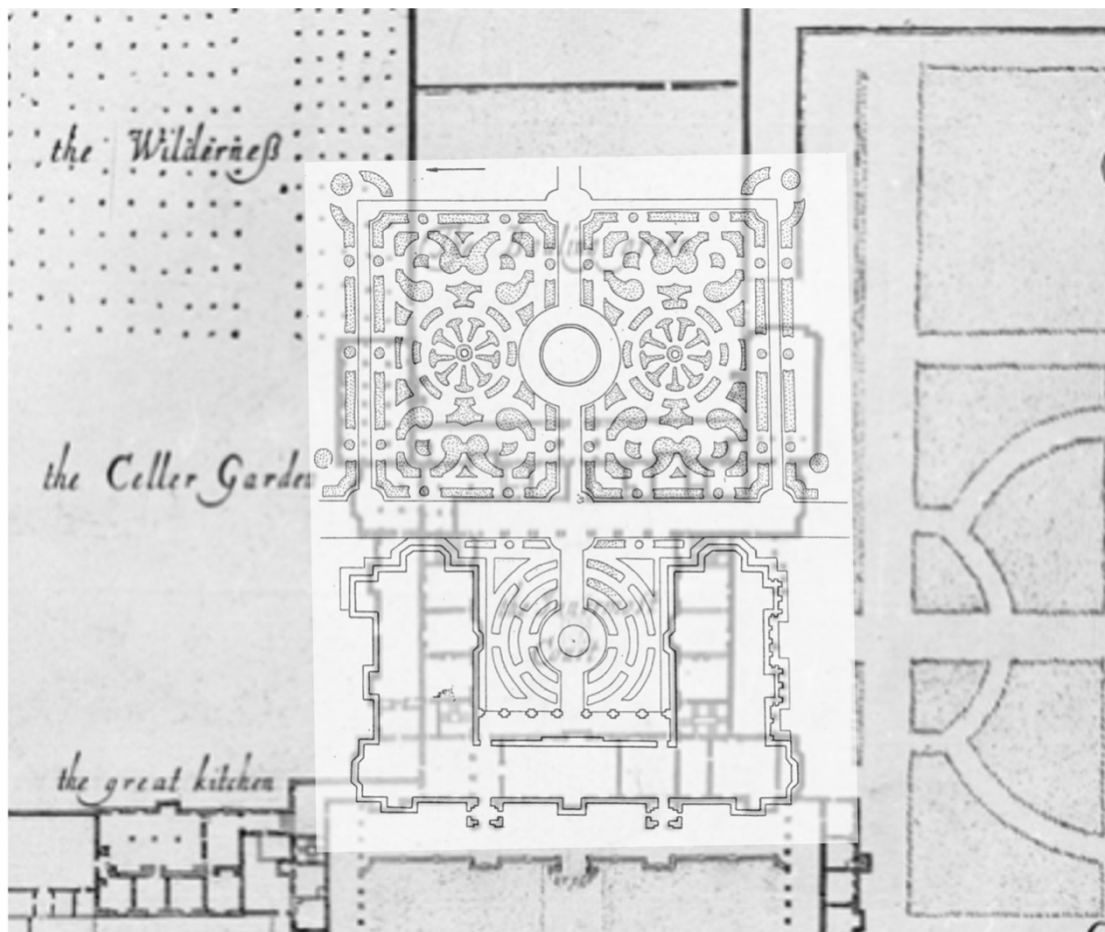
Part of ground plan of house and grounds by Henry Winstanley, north to left, overlaid by plan of the 1832 parterre garden (although not to exact scale due to challenges in reconciling the parterre drawing with other plans). Sources: Historic England Archive (P/Y02117/003), and (Cunningham, 1987b, 11) © English Heritage.
